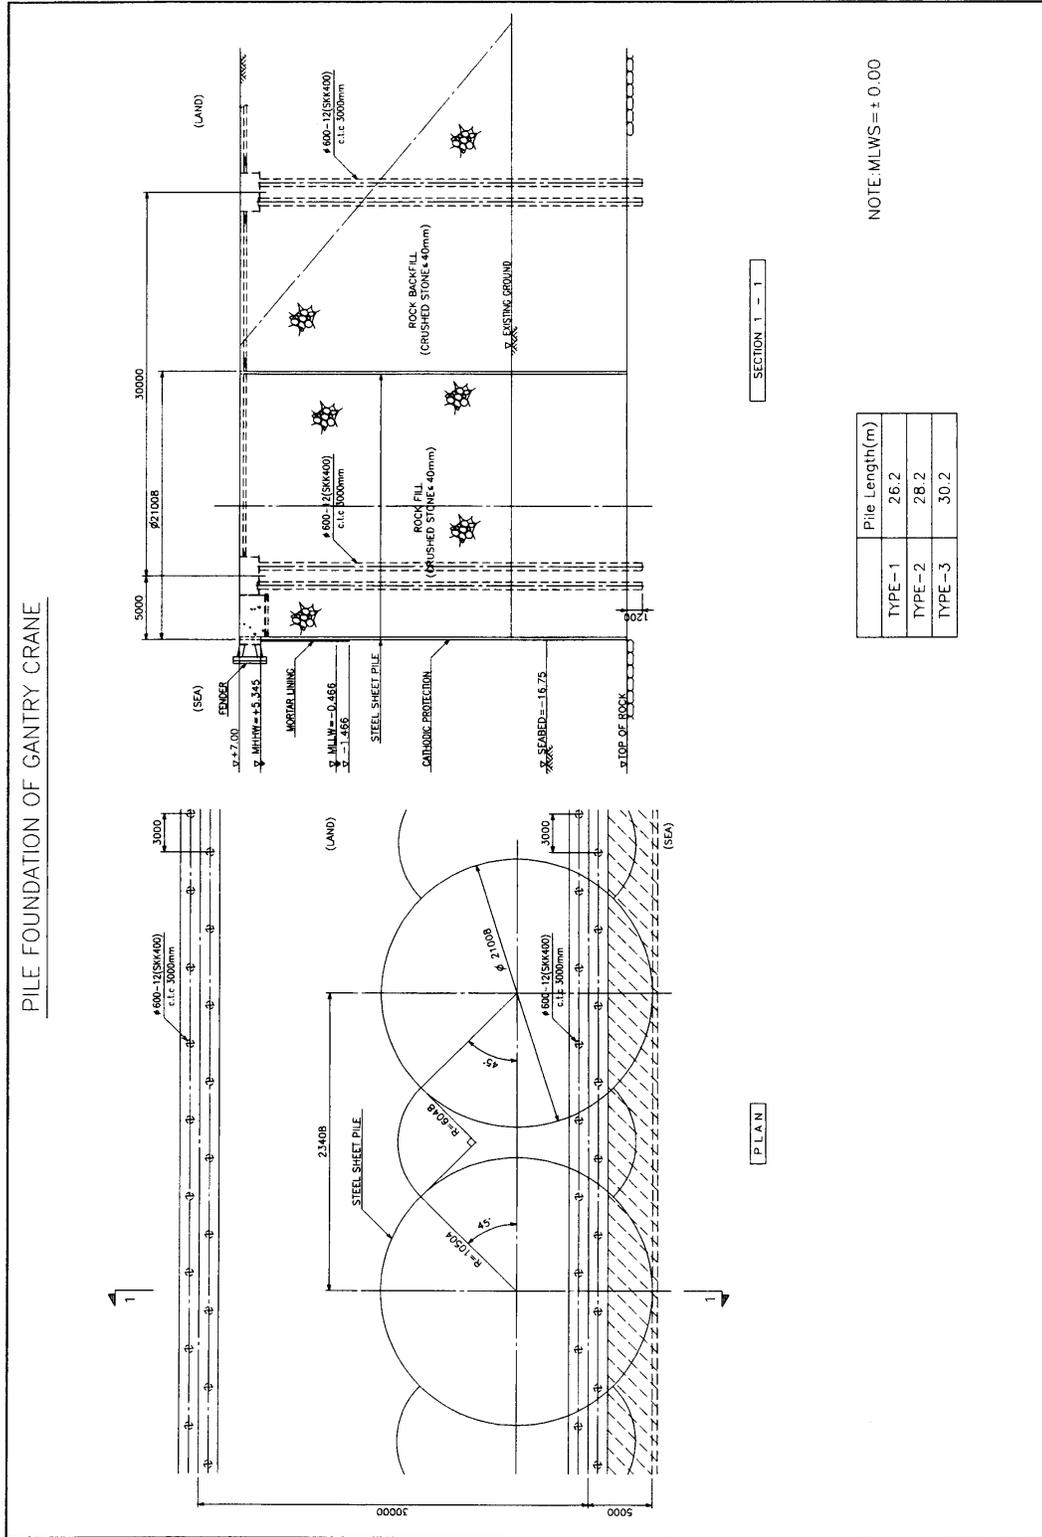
Pile Foundation of Gantry Crane in Quaywall Side
